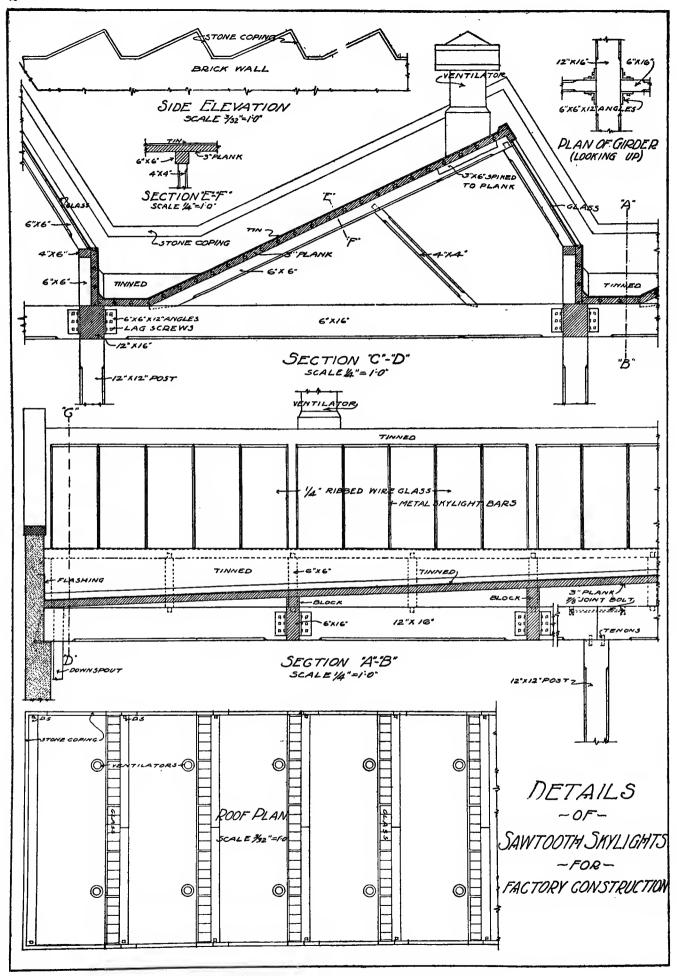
SAW-TOOTH SKYLIGHT ROOF
